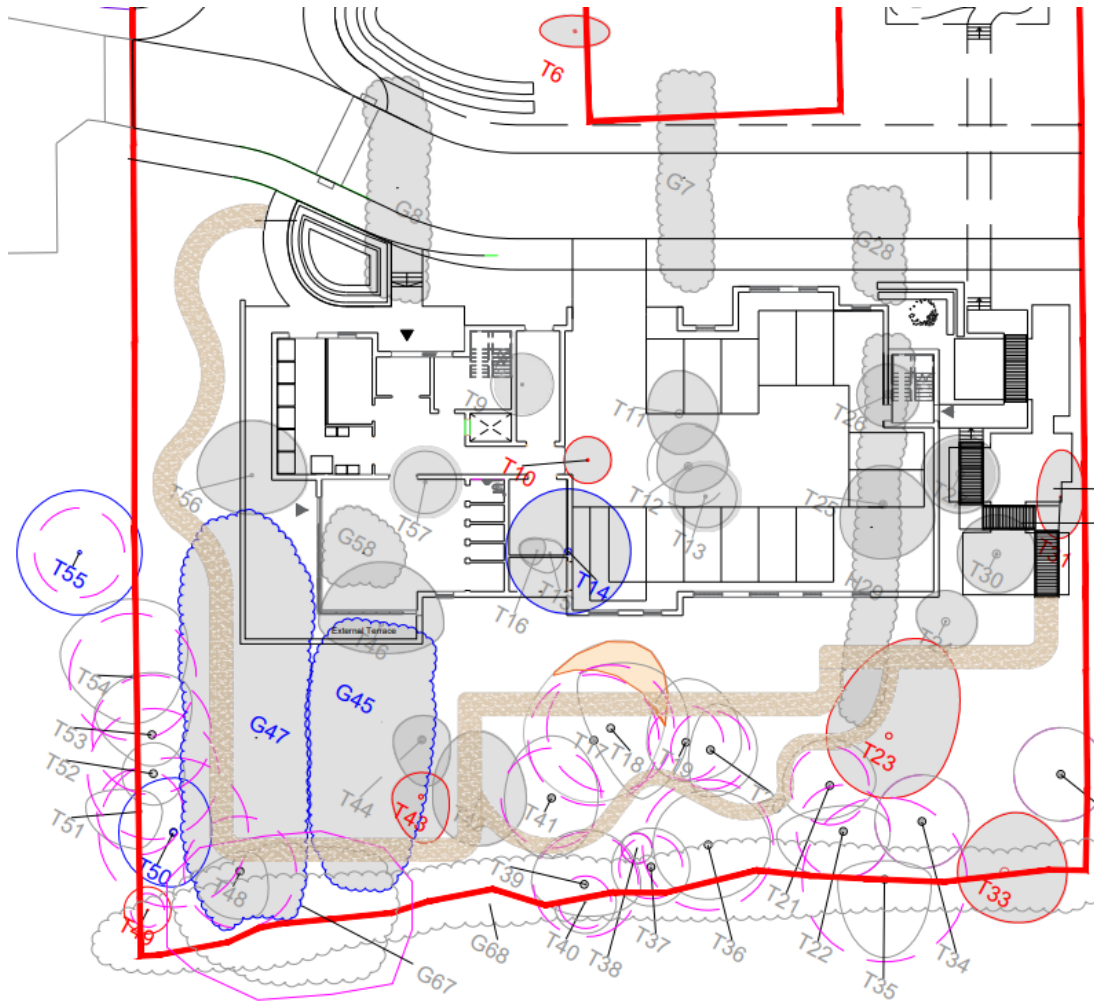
190835 approved landscape masterplan & tree protection plan (by 210829)
